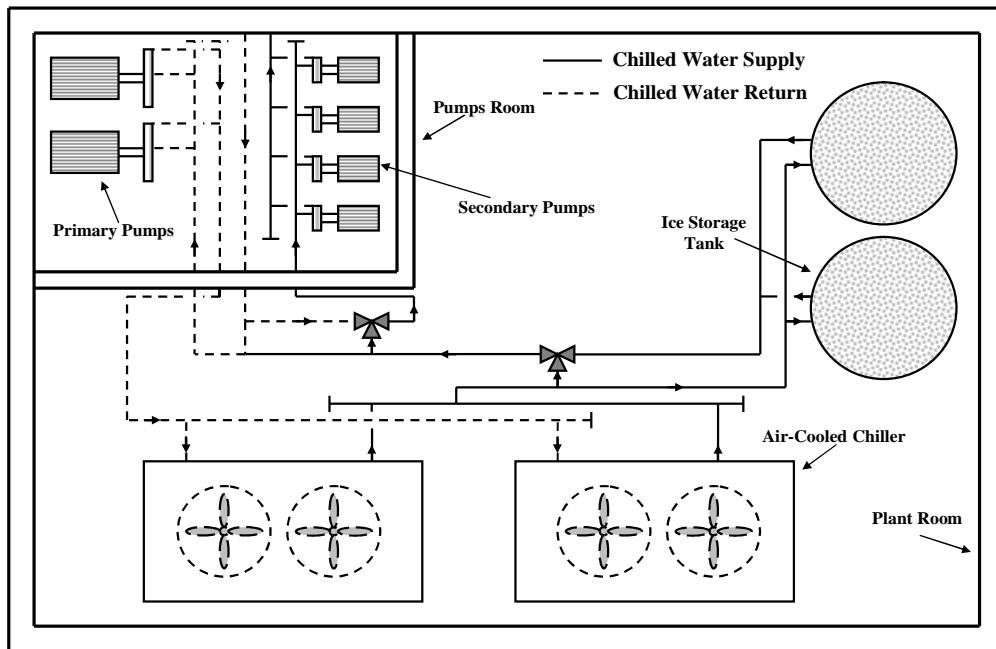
Piping arrangement in the plant room for the ice thermal storage system.
